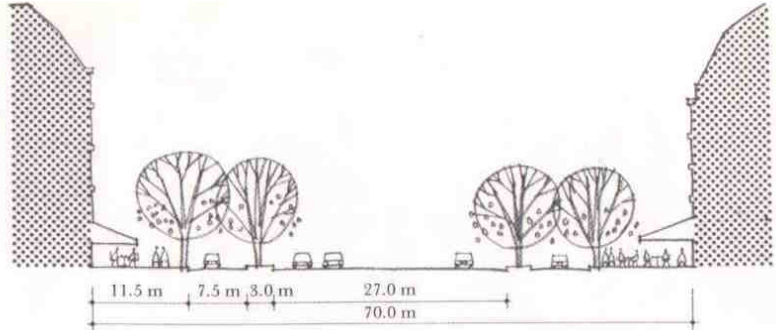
Section of Champs-Elysees (Ashihara, 1983) Distance between buildings=70m, pavement width=11.5 m.
